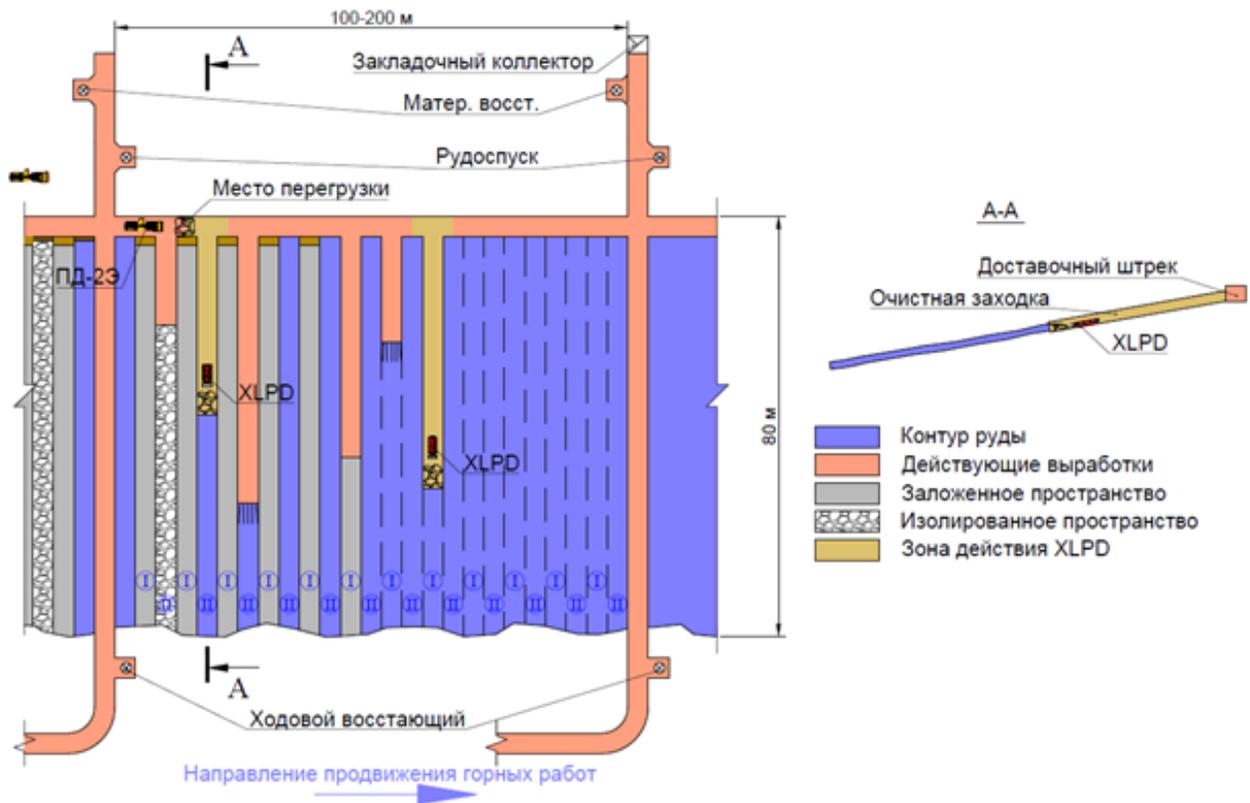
Recommended block development and extraction plan using the XLPD LHD
